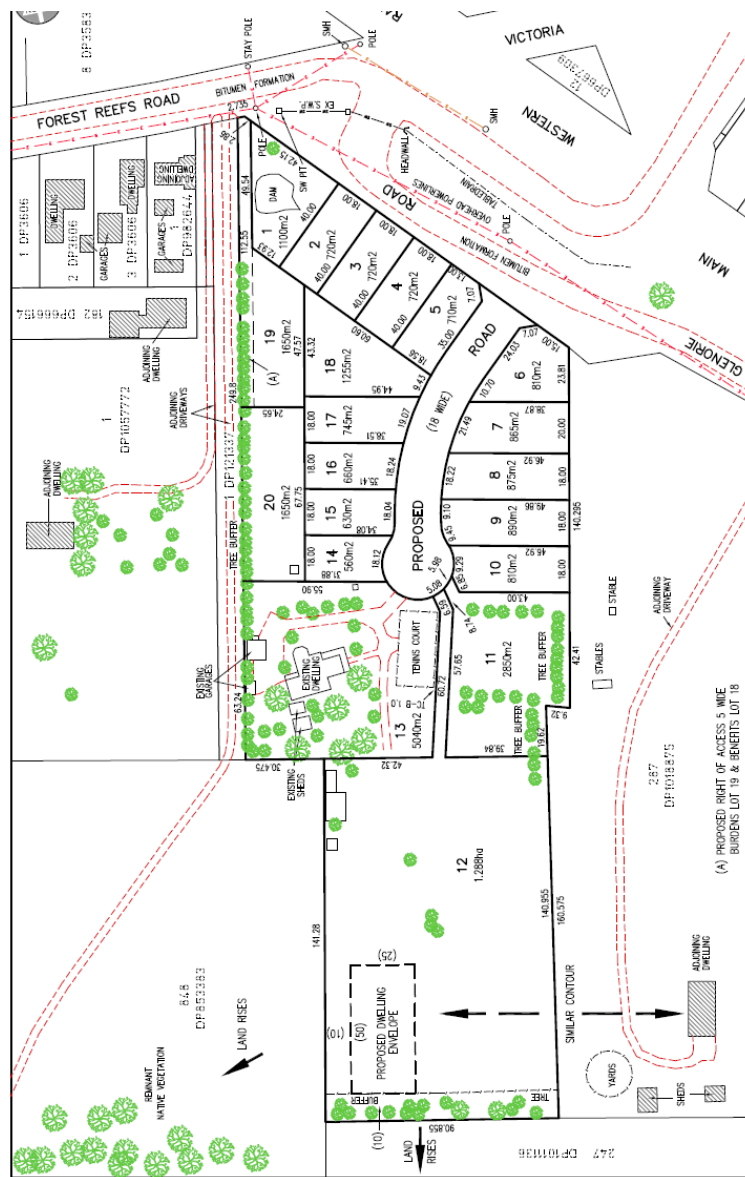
Potential subdivision concept layout by Peter Basha Planning and Development if property is rezoned to RU5 Village.
